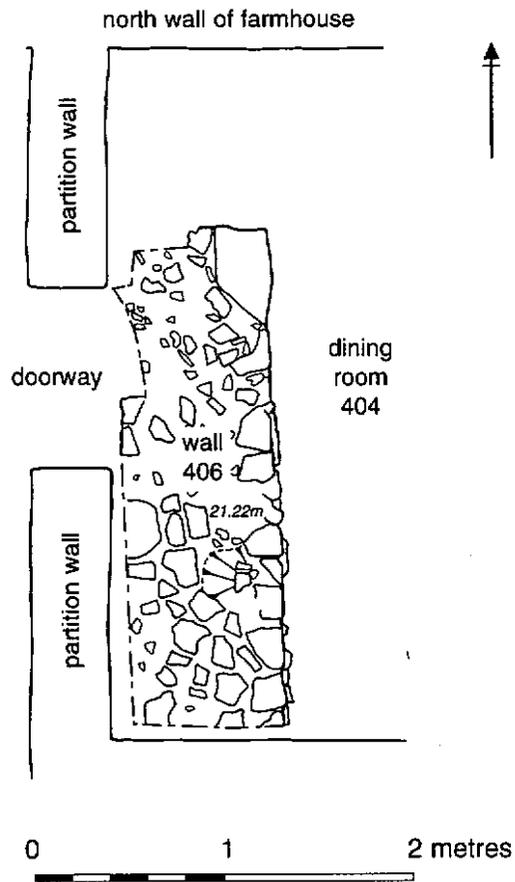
Plan showing medieval wall 406 within the farmhouse (Area 4), scale 1:40
